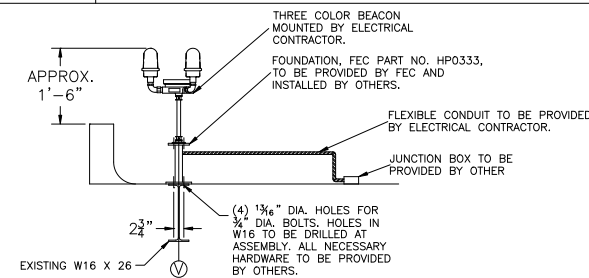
TYPICAL PERIMETER LIGHT CONNECTION
